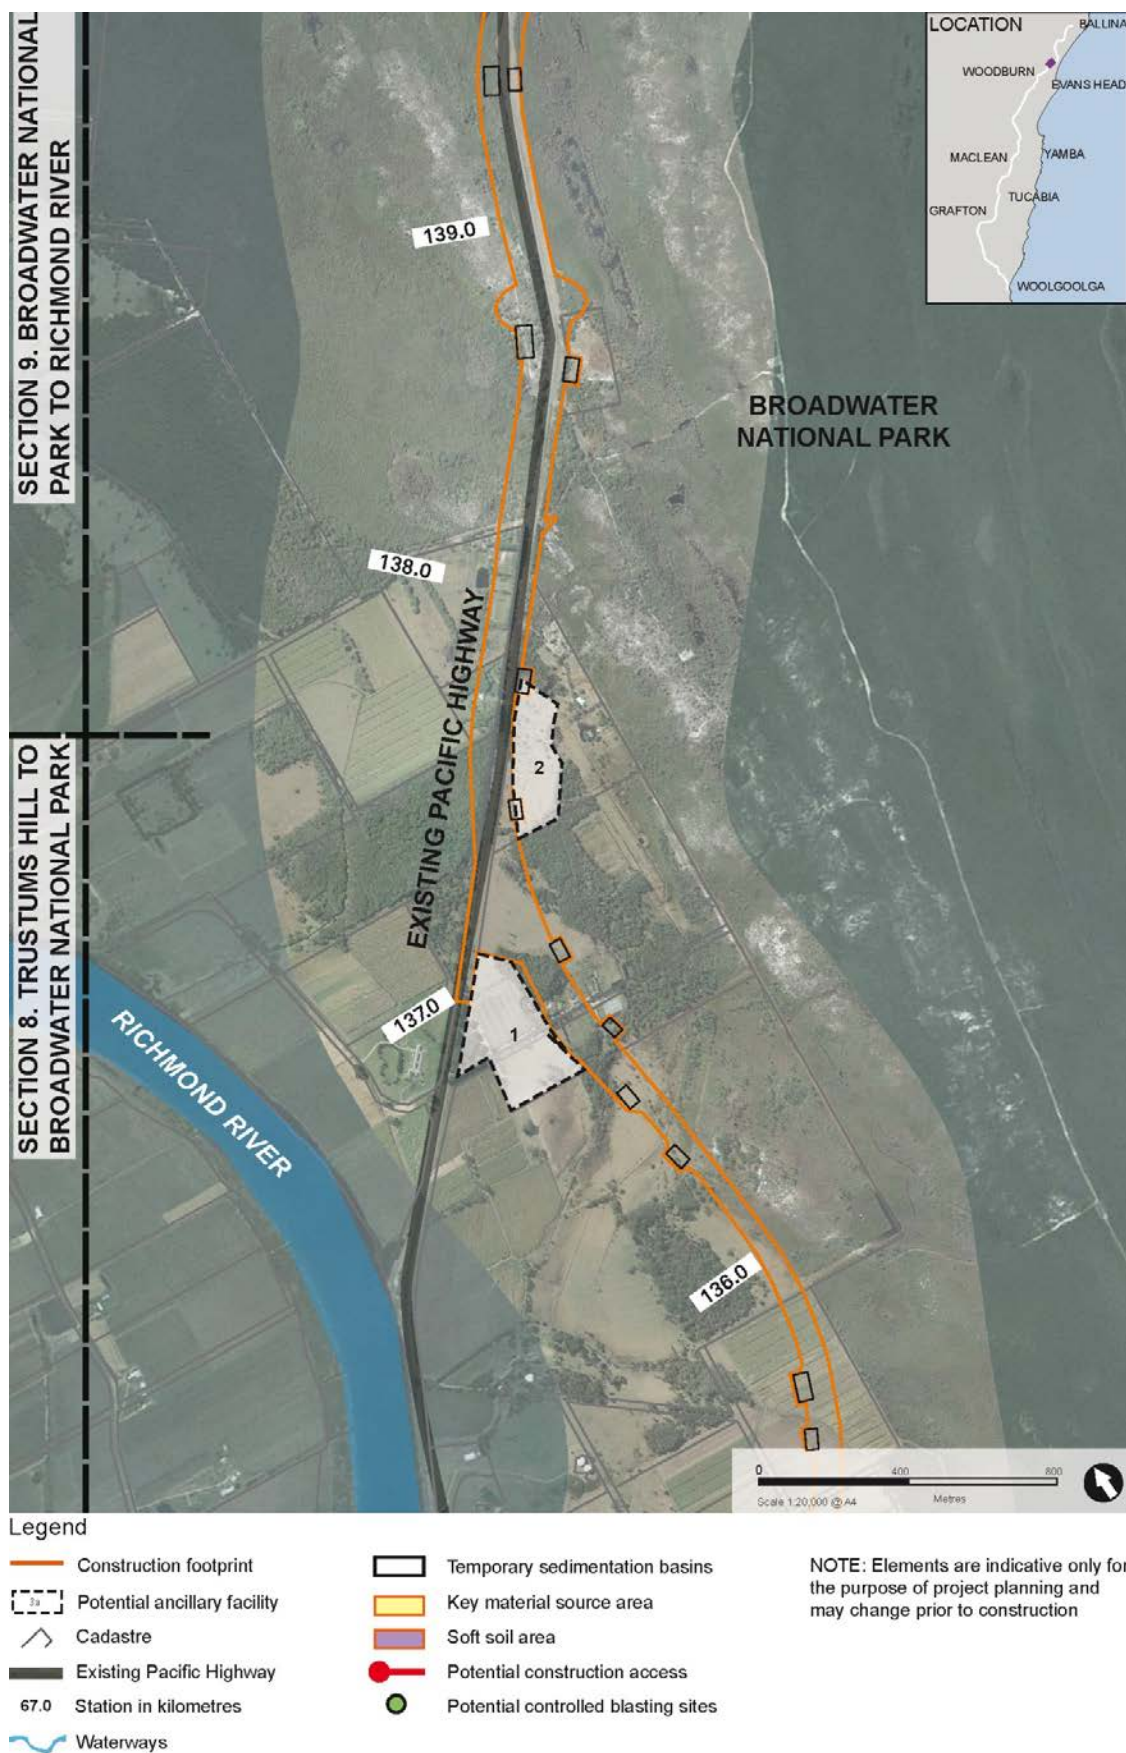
Extent of construction and construction features Section 8 (Station 135.4 to 139.5)
